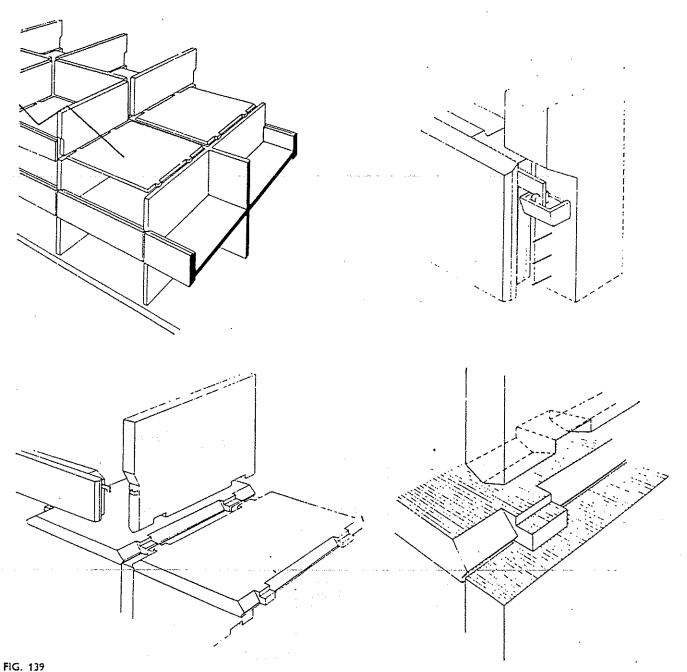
The Spanciad system (United Kingdom): (a) general scheme, (b) support of slabs on a girder, and (c) support of slabs on exterior wall.
